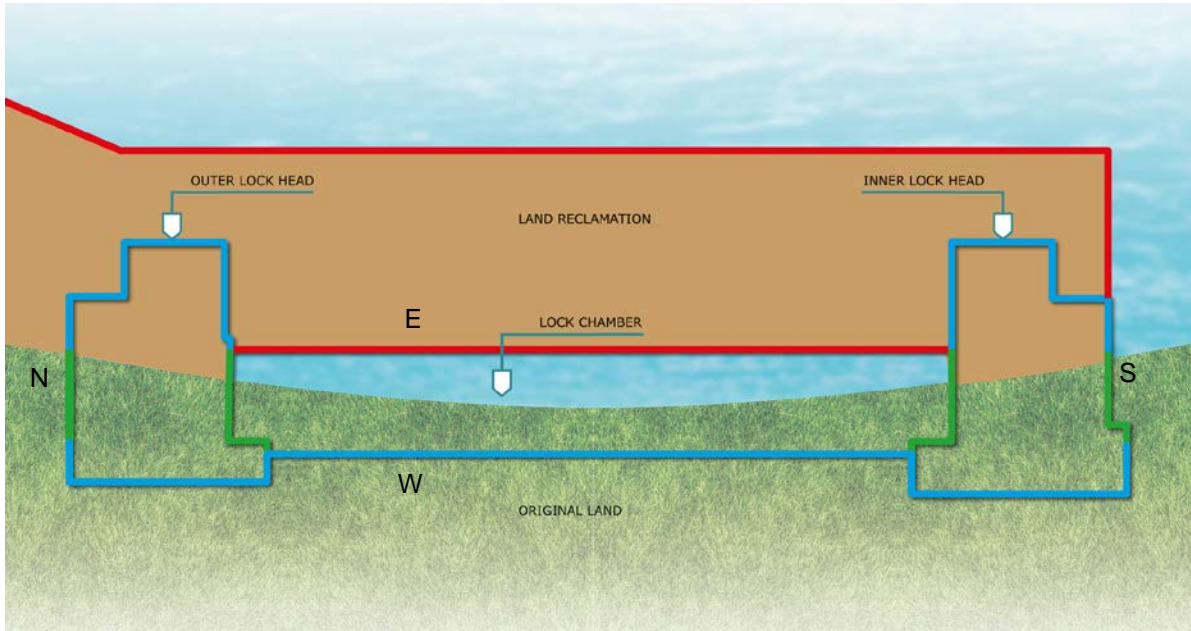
On the reclaimed land, deep diaphragm walls (blue) are built to form the lock heads and western lock chamber Wall.
